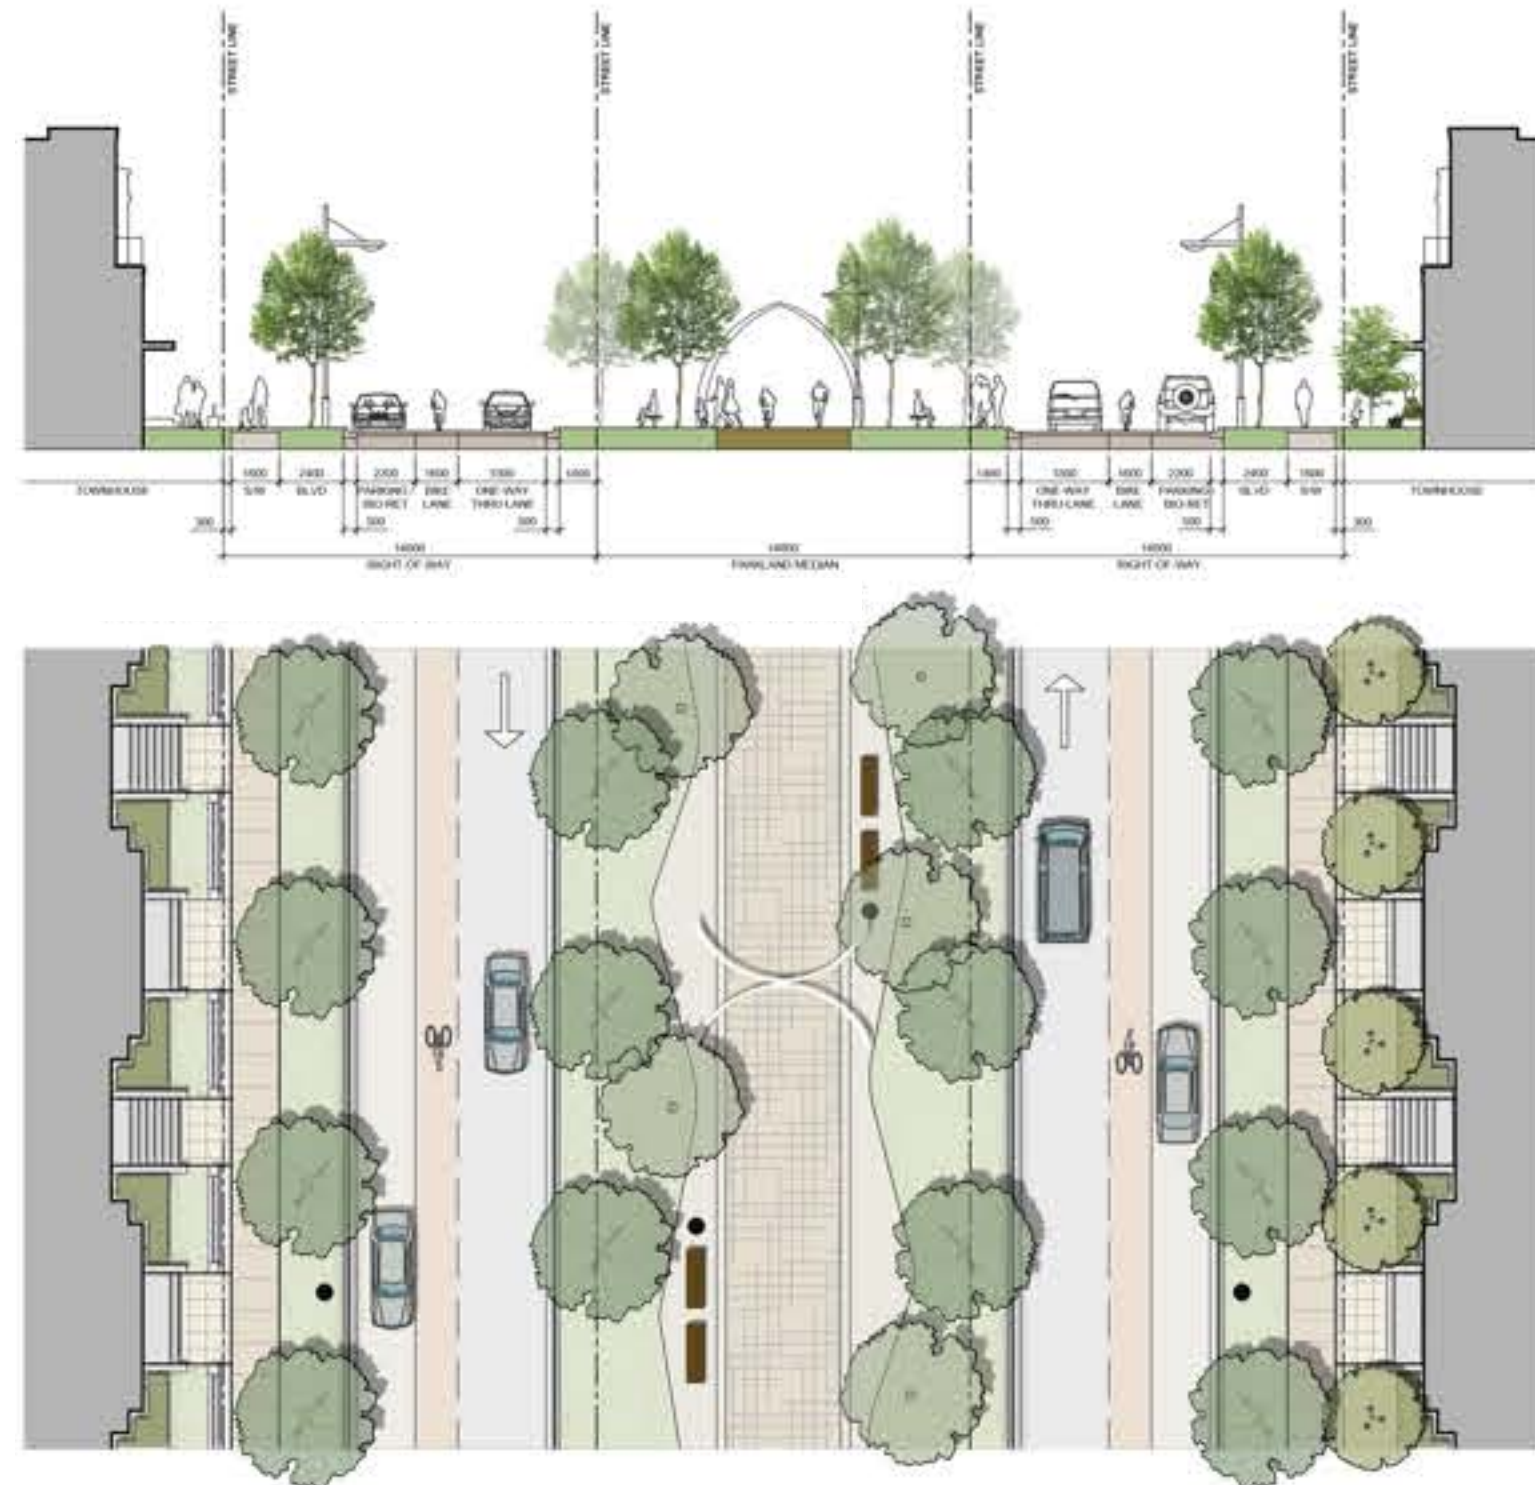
14.0m ROW - One way thru lane; on-street bike lanes; on-street parking; side-walk on both sides of the street; central parkland median and street trees in grass boulevard
